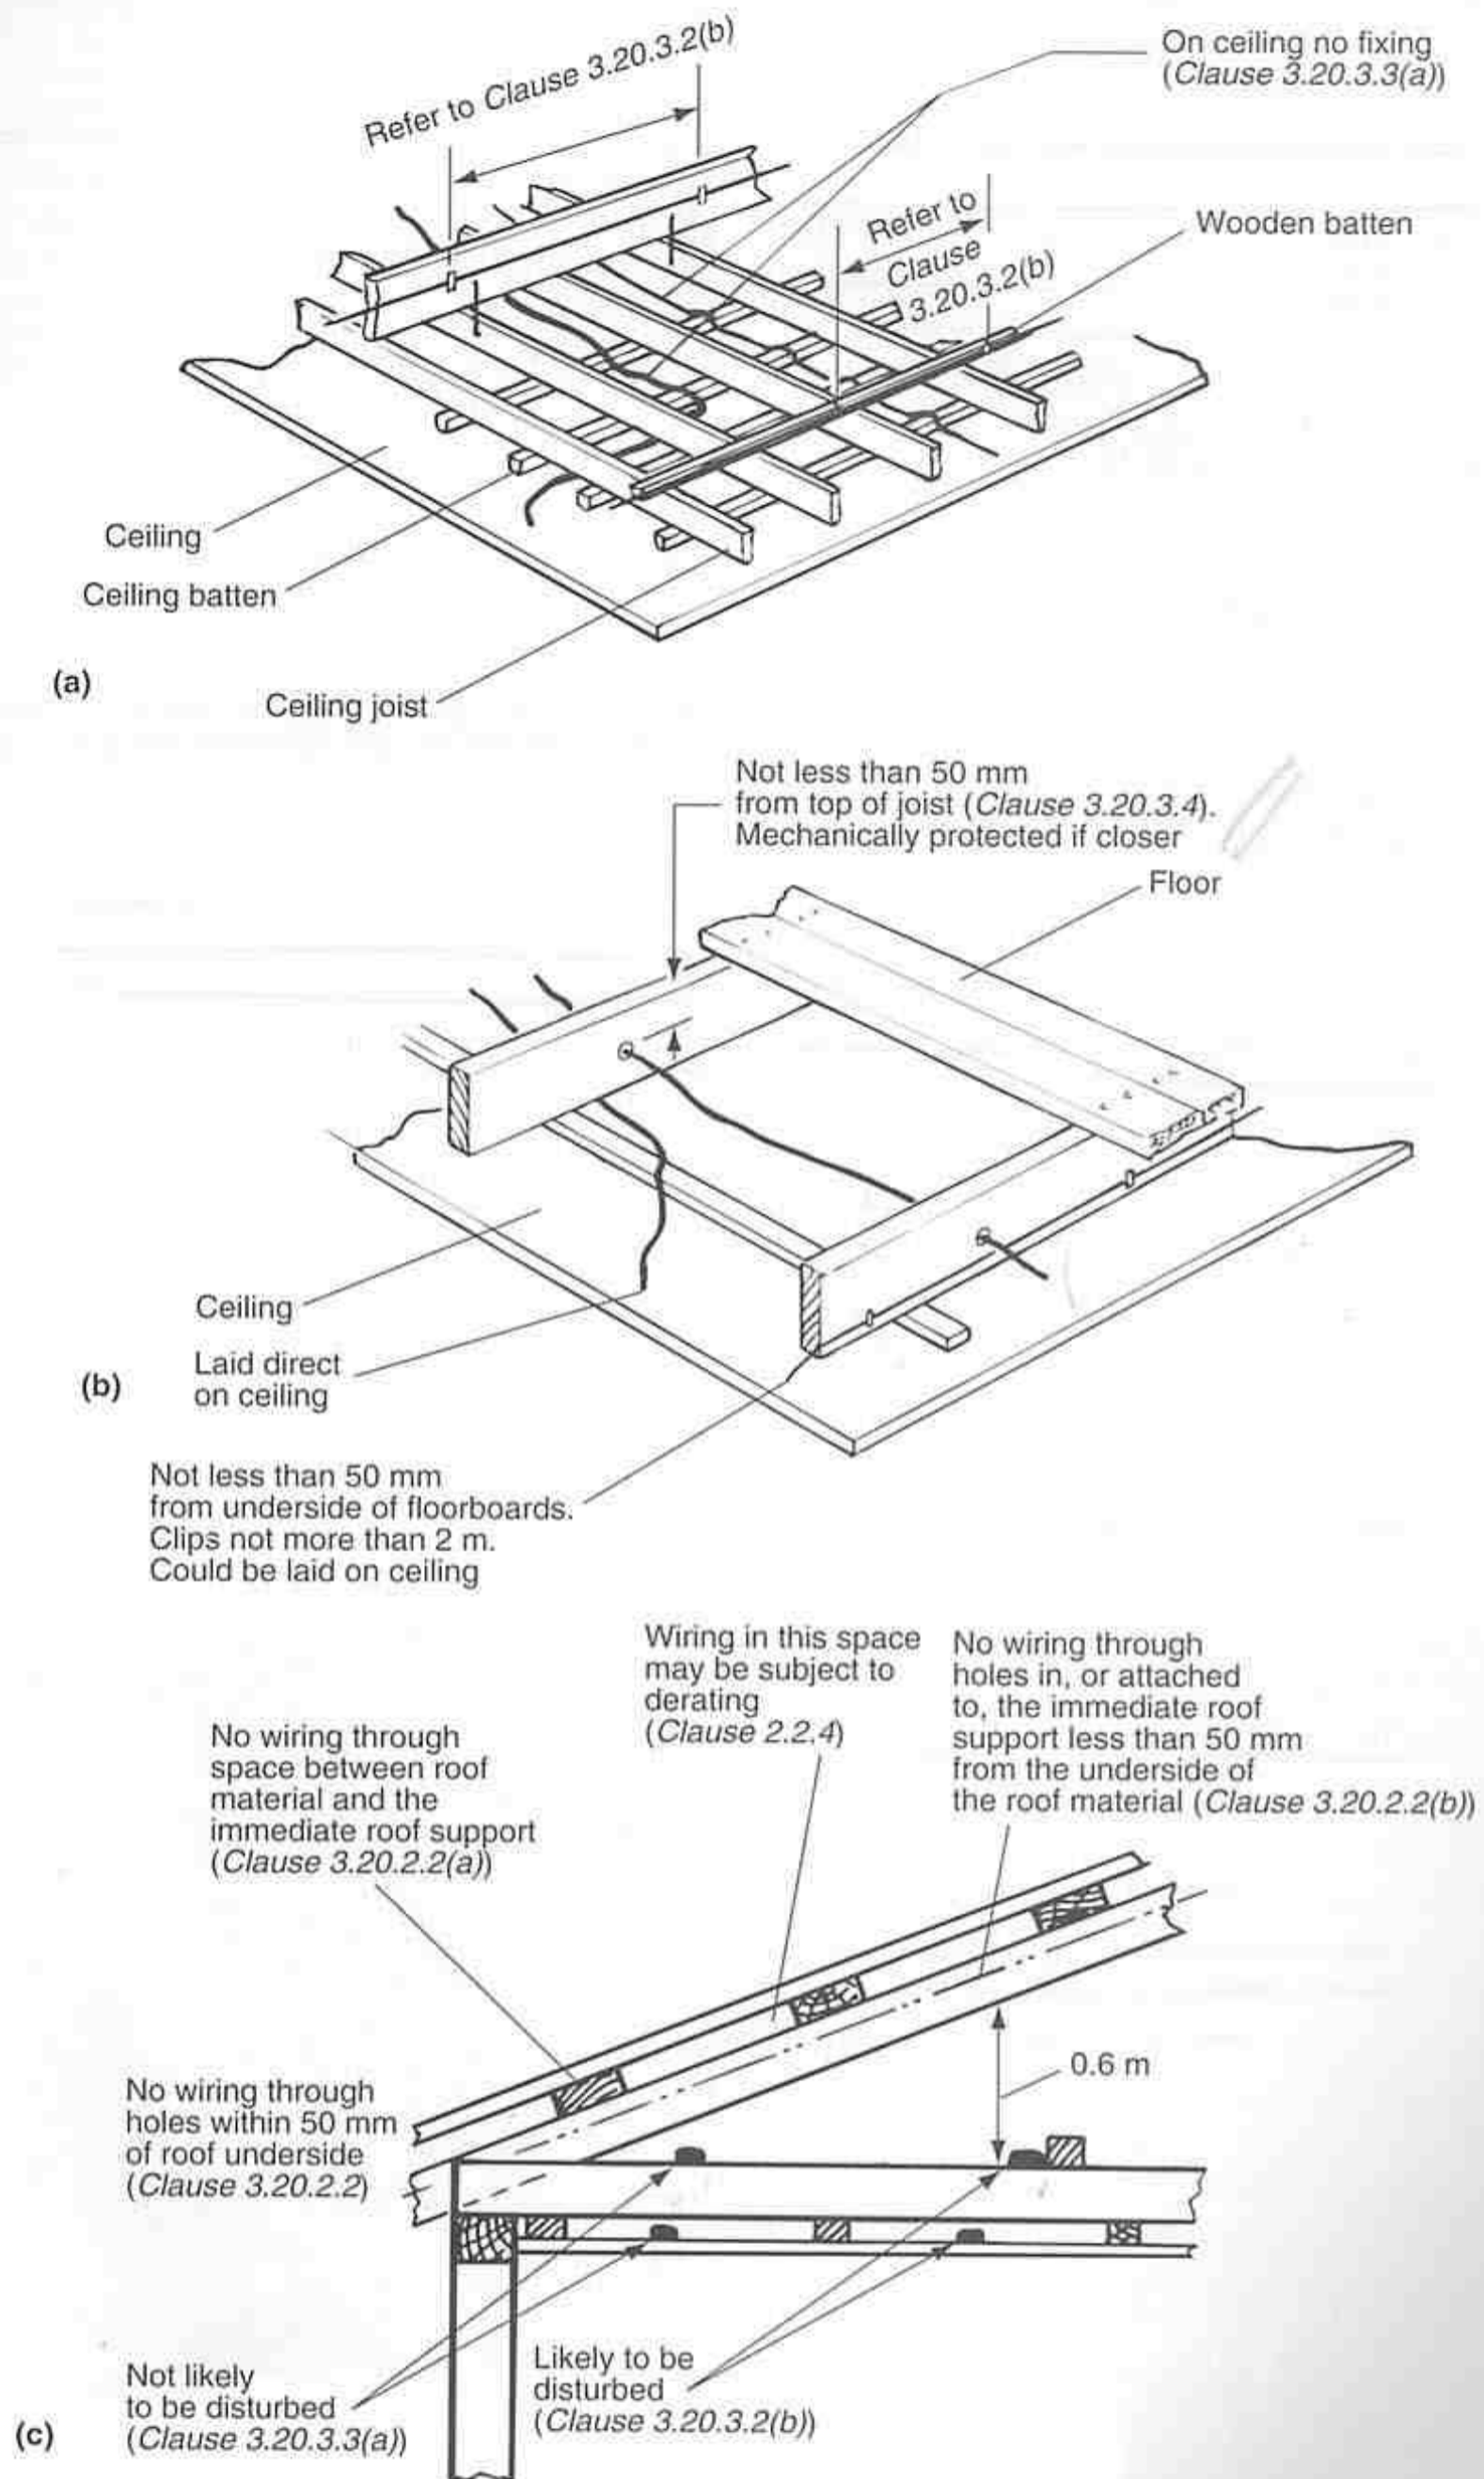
TPS wiring: (a) in a ceiling space; (b) between a floor and an uppermost ceiling; (c) between ceiling and roof
